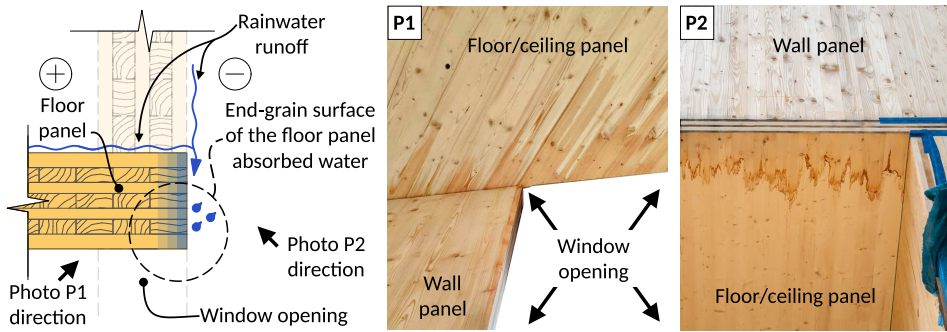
CLT intermediate ceiling (floor) connection with a window opening, where frequent wetting occurred (P1 = building B, P2 = building F).
